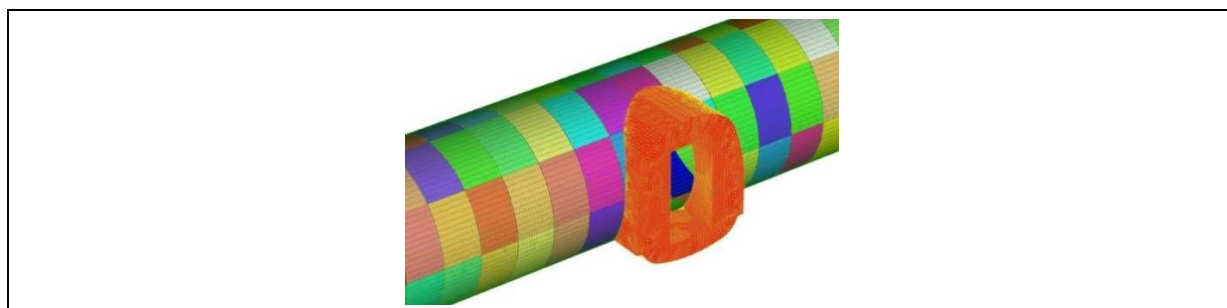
Permanent cast in-situ reinforced concrete collar at cross passage opening area - 3D Model
